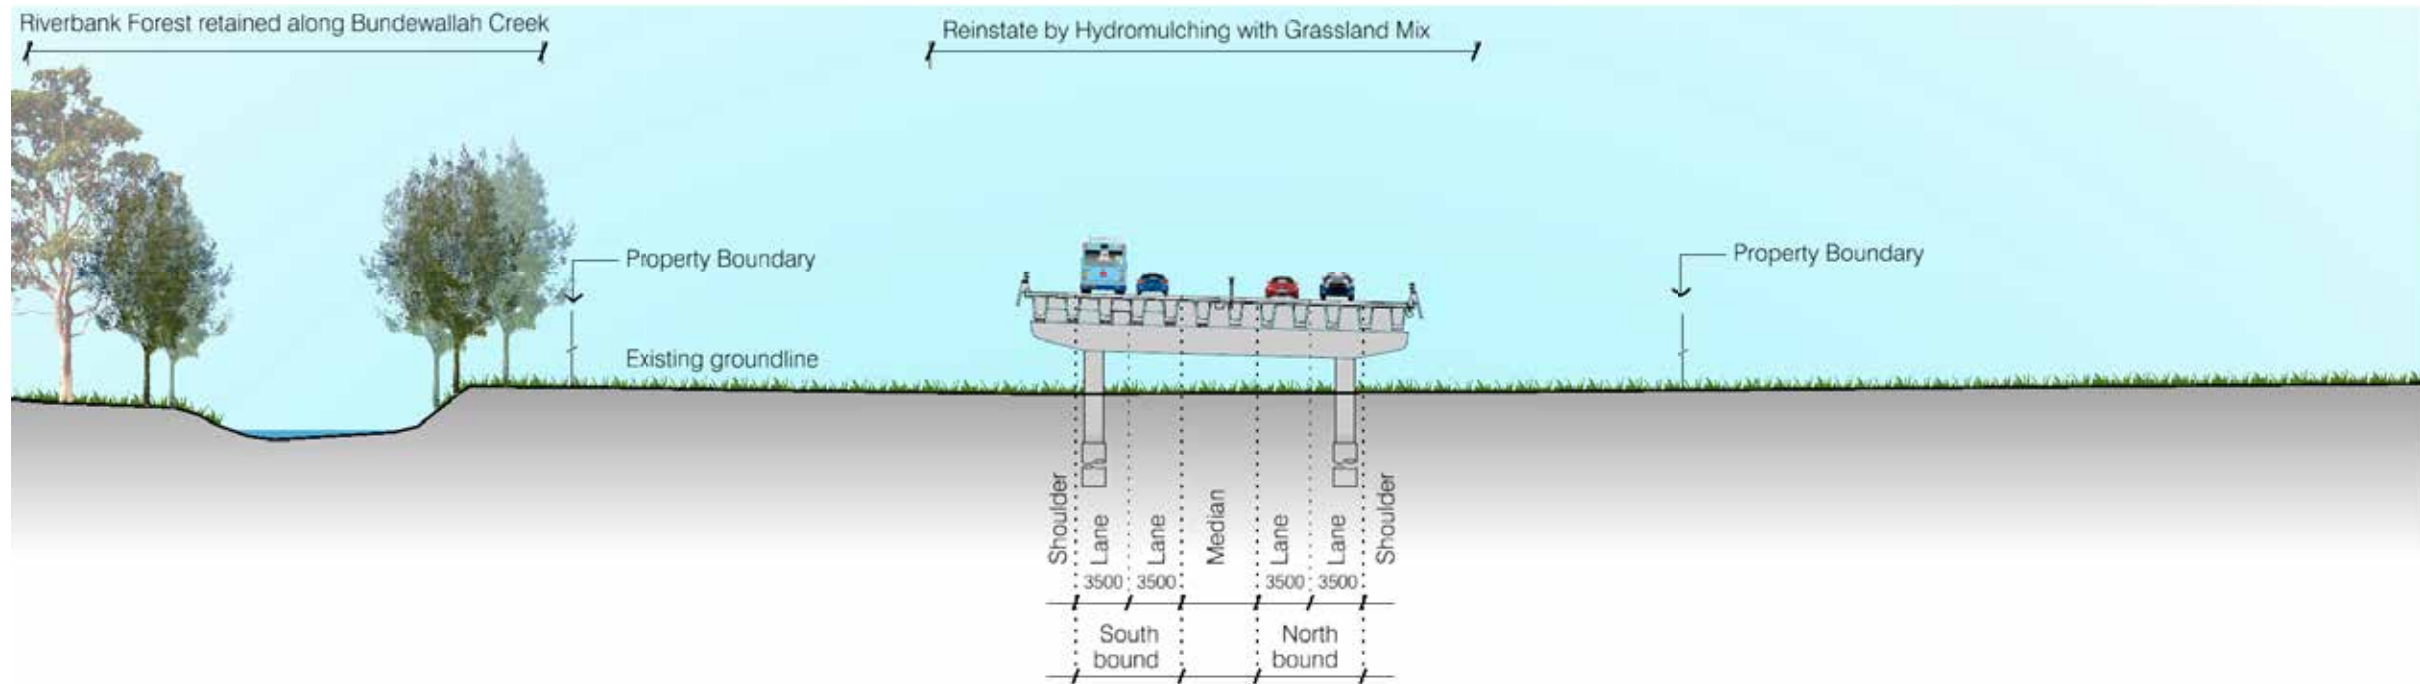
Road cross section at Ch. 16150 (Scale 1:500 @ A3)
